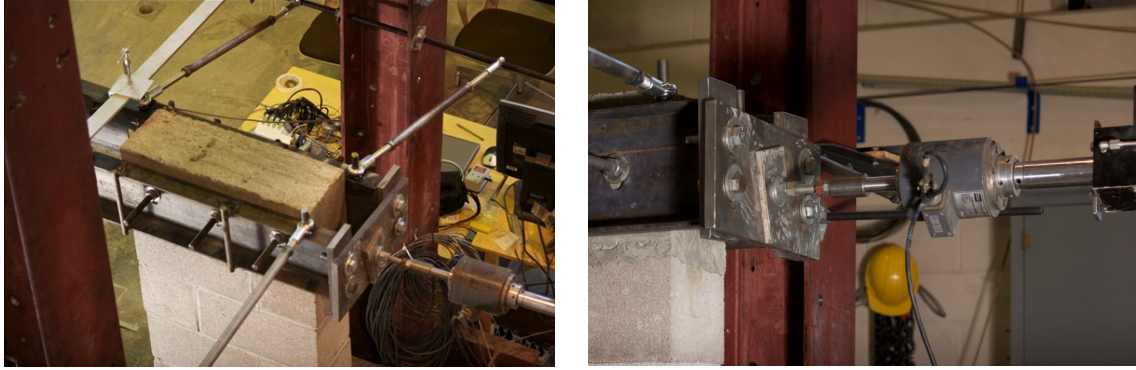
a) Loading channels and out-of-plane braces (view from top) b) ram connected to specimen
